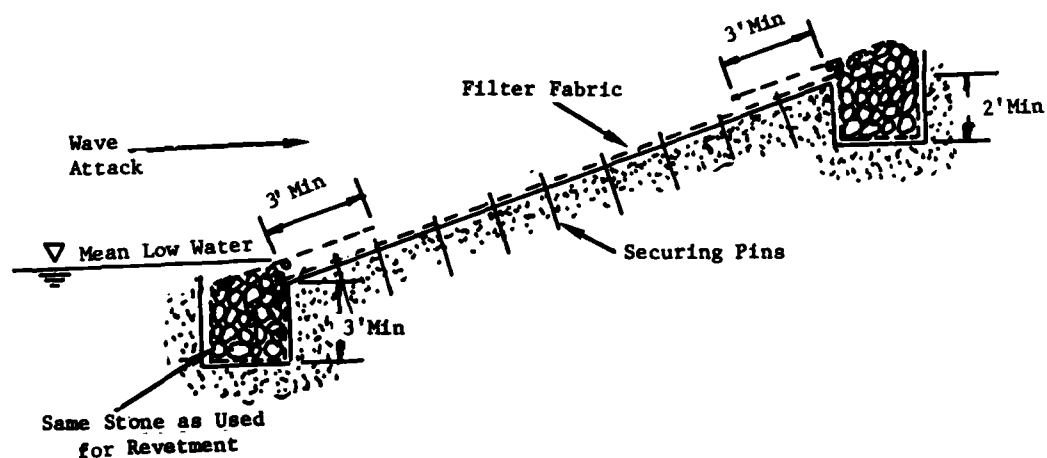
Filter fabric on bank subject to wave attack showing placement of vertical-wall key trench at toe and top bank. Revetment materials have not yet been placed on fabric
